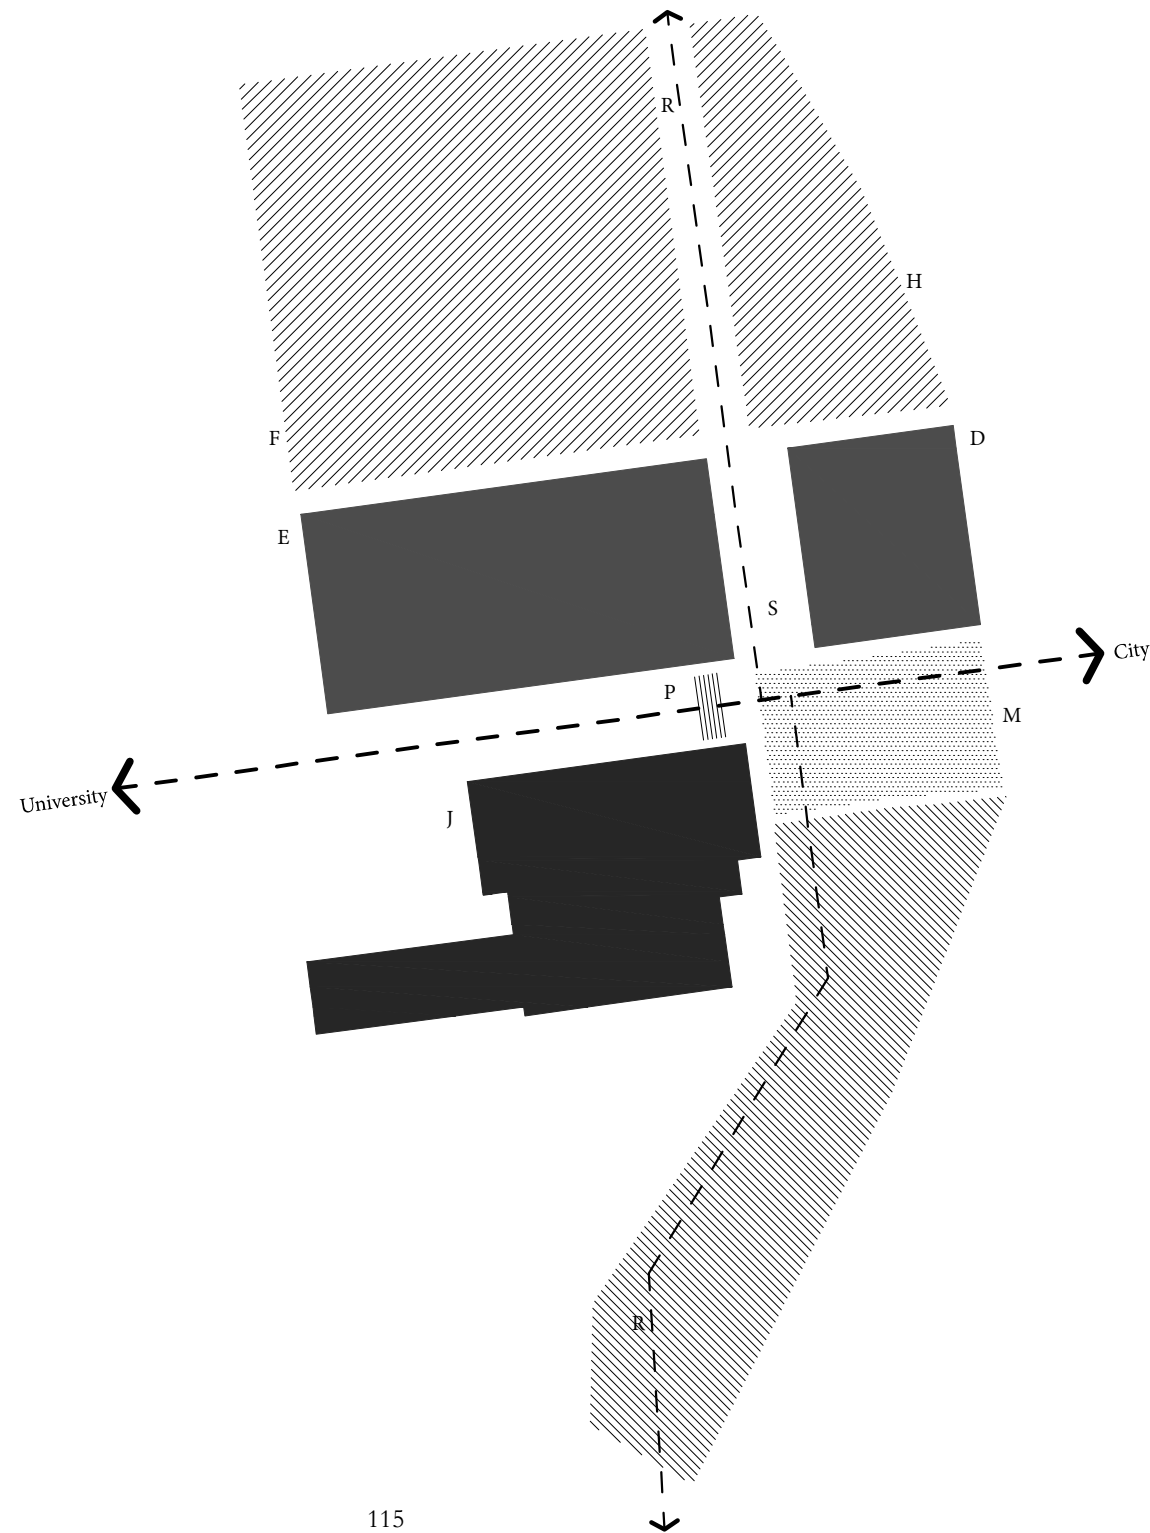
Conceptual sketch of proposed building after design charette (Author, 2020)
